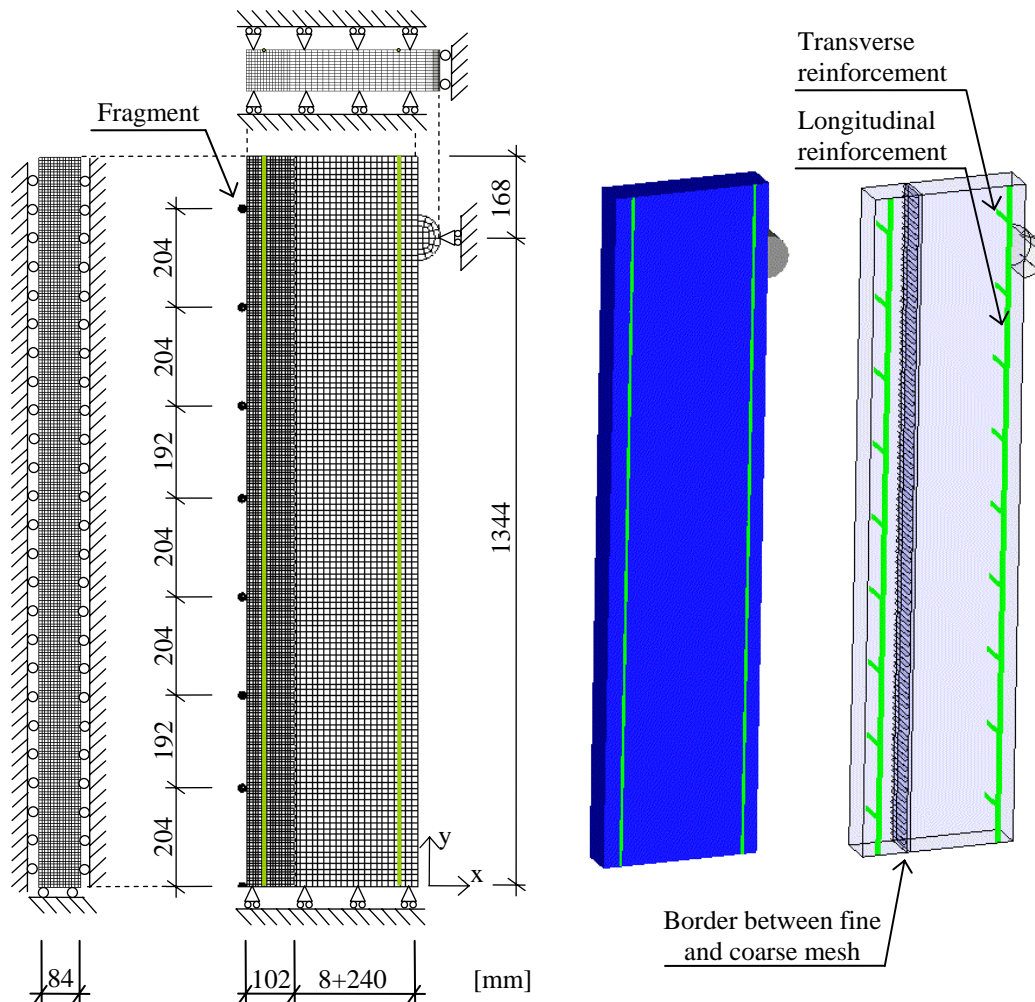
Numerical mesh of wall strip used in simulations, also showing reinforcement in the modelled wall strip.
